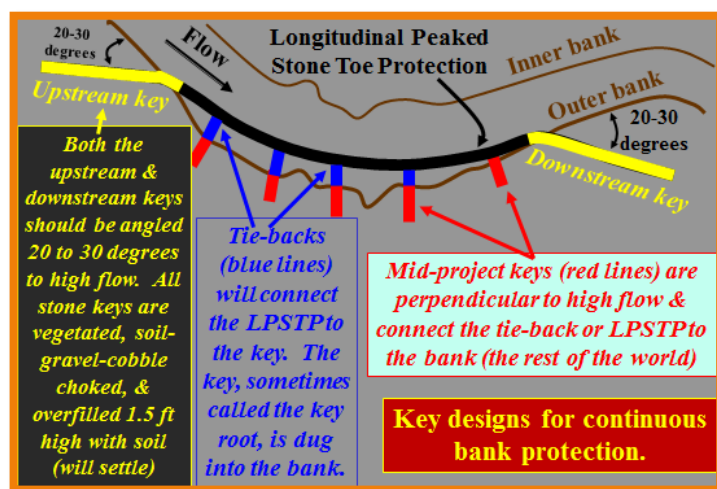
Key installation connected to Longitudinal Peaked Stone Toe Protection (LPSTP). Derrick.
